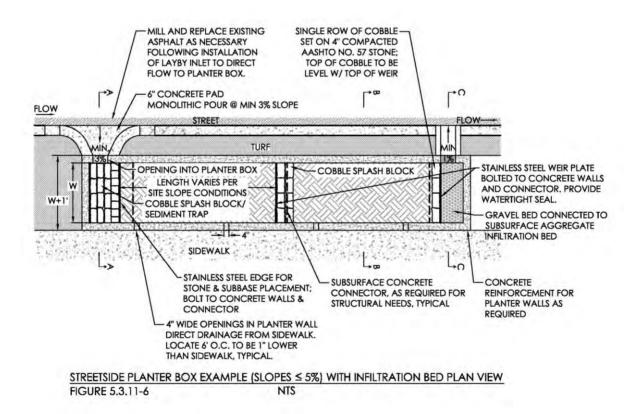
Example of streetside planter box (plan view). Weirs are used to "step" the sections of the planter box down the slope.
